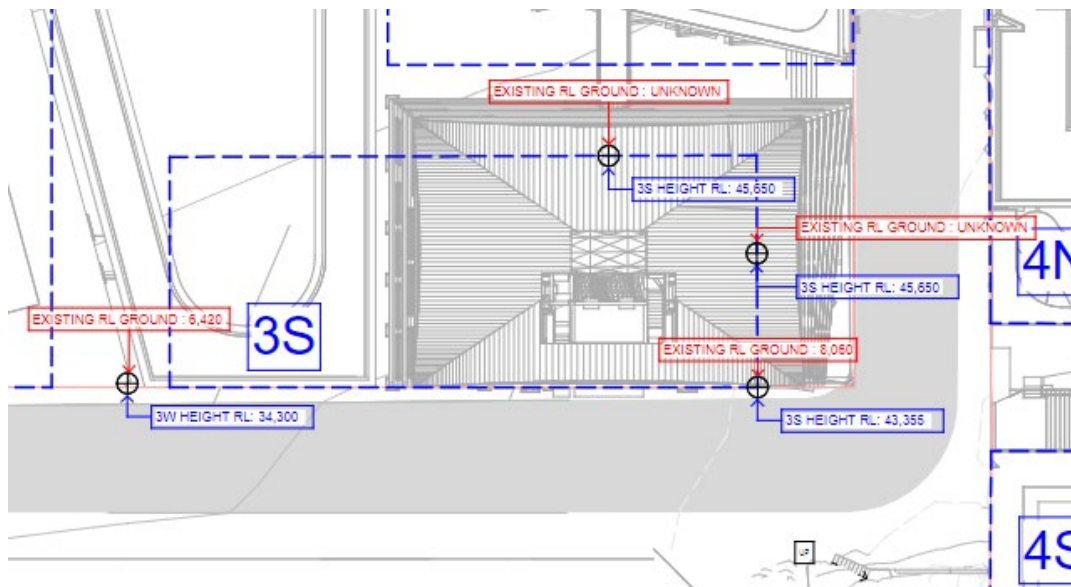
illustrates the heights outside the concept plan massing and LEP height RL polygons for Building 3 West and Figure 3 illustrates the heights outside the concept plan massing and LEP height RL polygons for Building 3 South.
